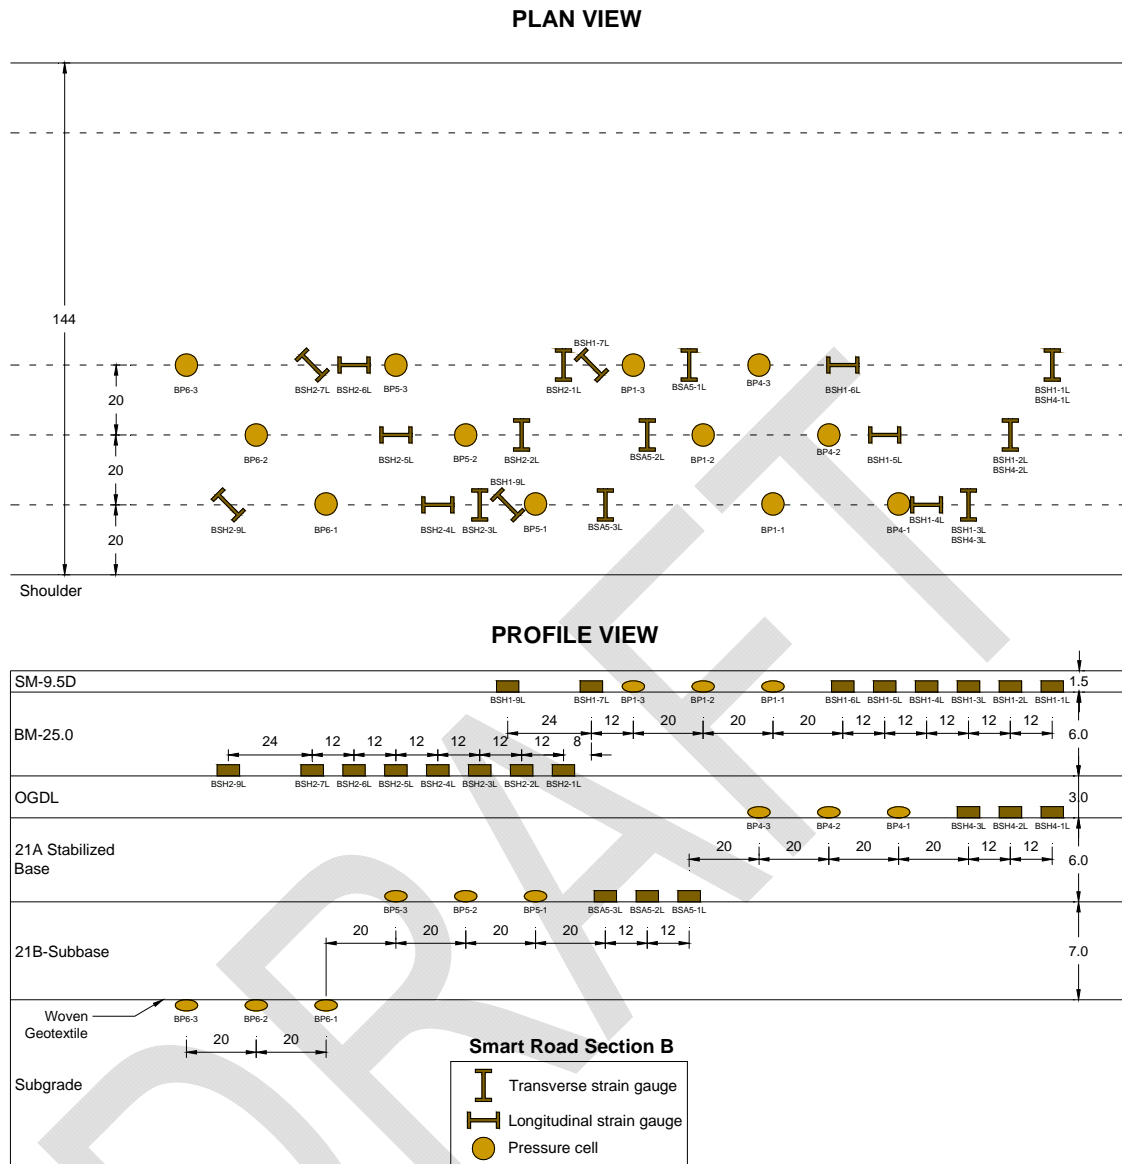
Plan and profile view of pavement structure and instrumentation of Section B, Virginia Smart Road
